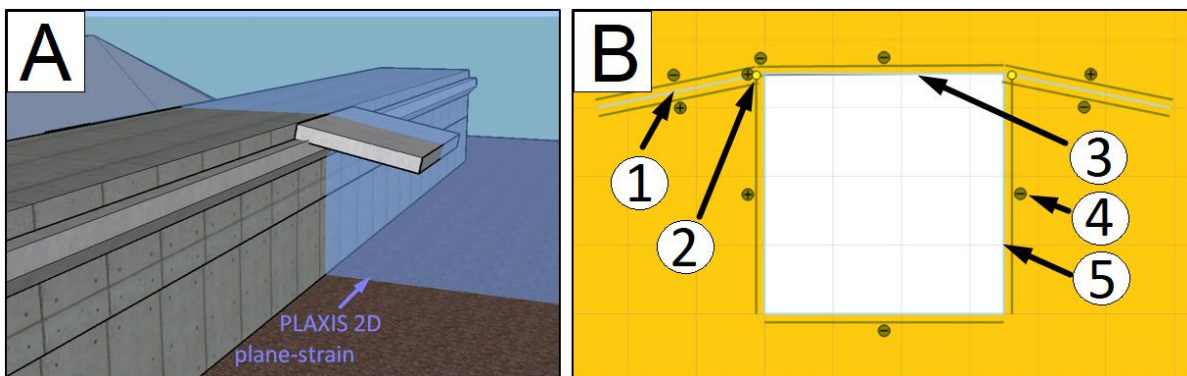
Modelling principles for a square concrete culvert, showing A) A 3D sketch of the plane in PLAXIS, and B) when the plane is transferred into PLAXIS showing ① the transition slab, ② the freely rotating hinge between culvert and slab ③ the roof/bottom elements, ④ the interfaces outside the culvert and ⑤ wall elements
